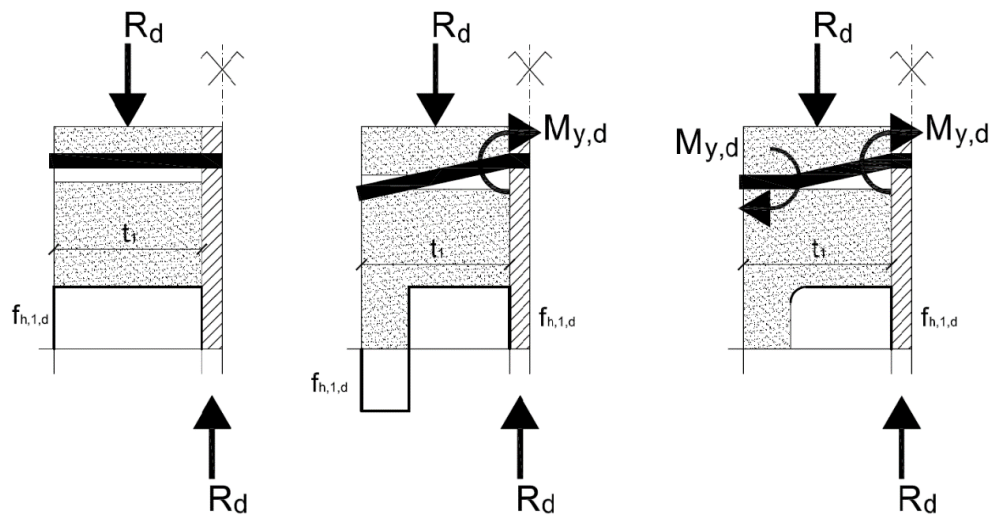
Fracture mechanisms of double-shear dowel type steel to timber joint
